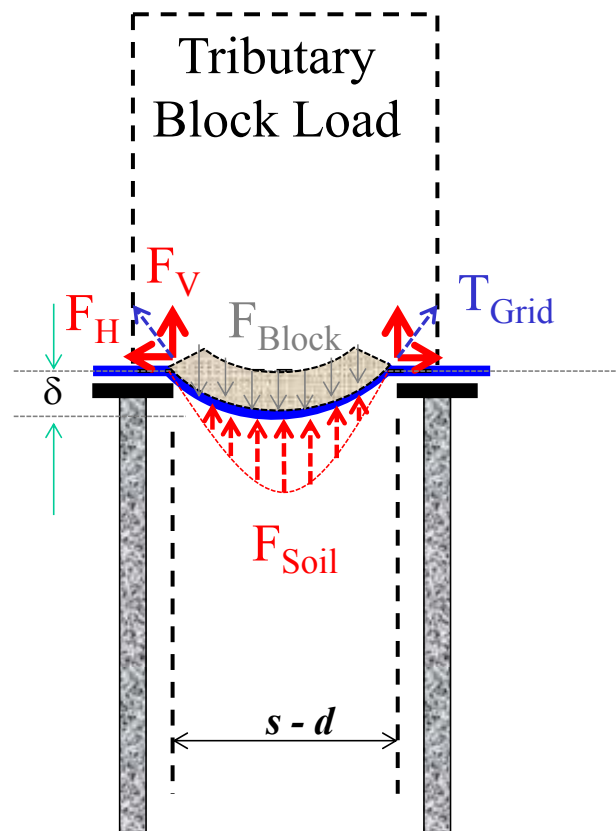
Vertical forces assumed for the deformed reinforcements in a pile supported embankment.
